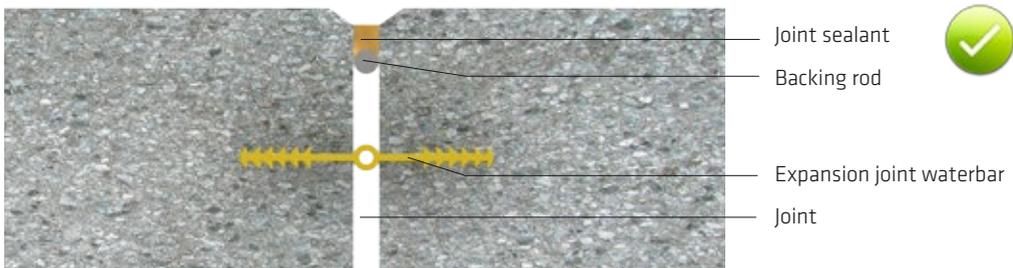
Joint waterproofing with a Westec® internal expansion joint waterbar (type 050) and sealing with a suitable joint sealant (i.e. Sikaflex)
